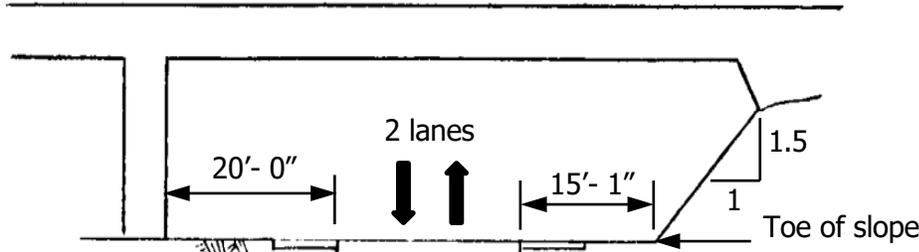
Bridge elevation view of horizontal clearances for a 2-lane highway with 2-way traffic below the bridge.
